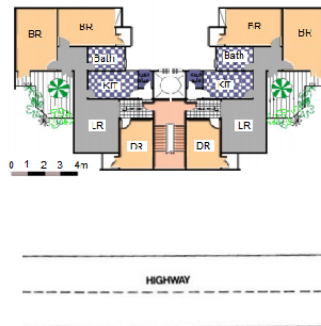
Room arrangement and balcony facing the road to reduce noise.
